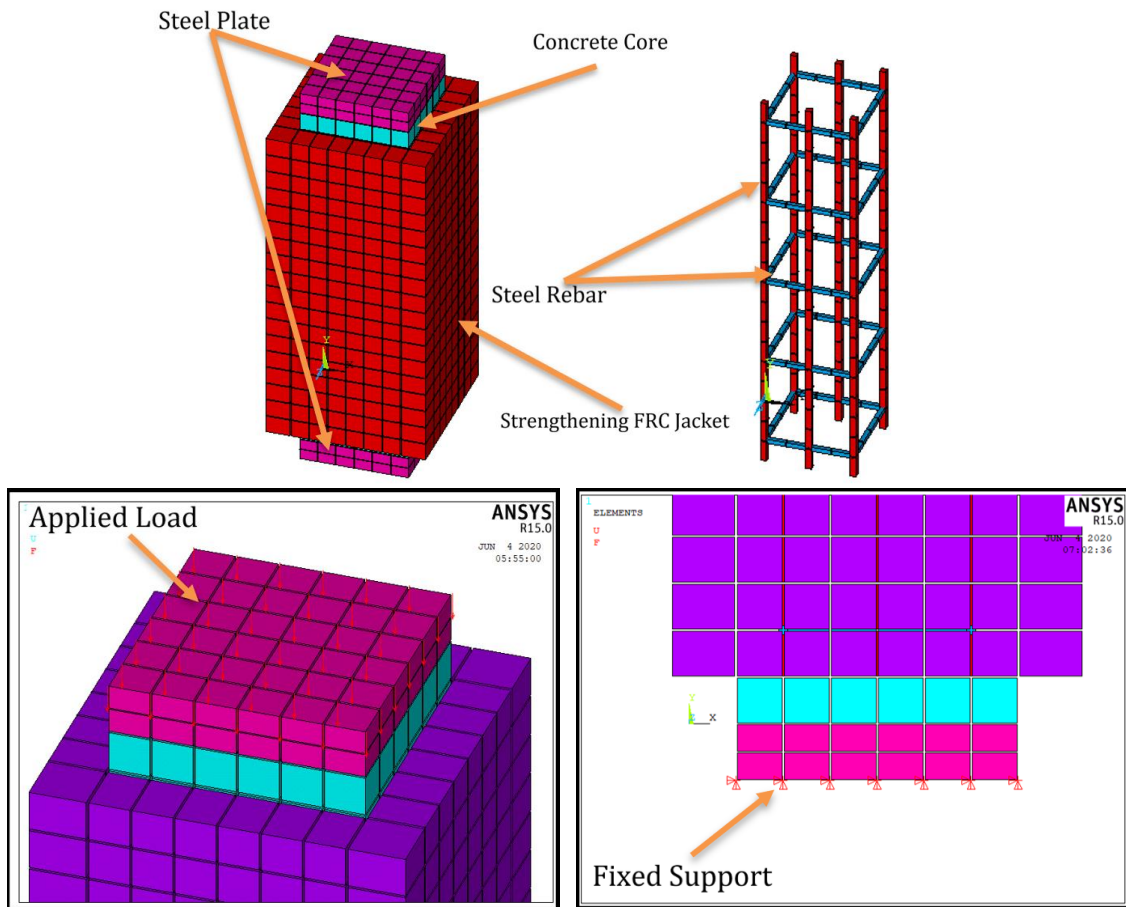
Finite element mesh of concrete core, strengthening jacket, and steel rebar analyzed columns
